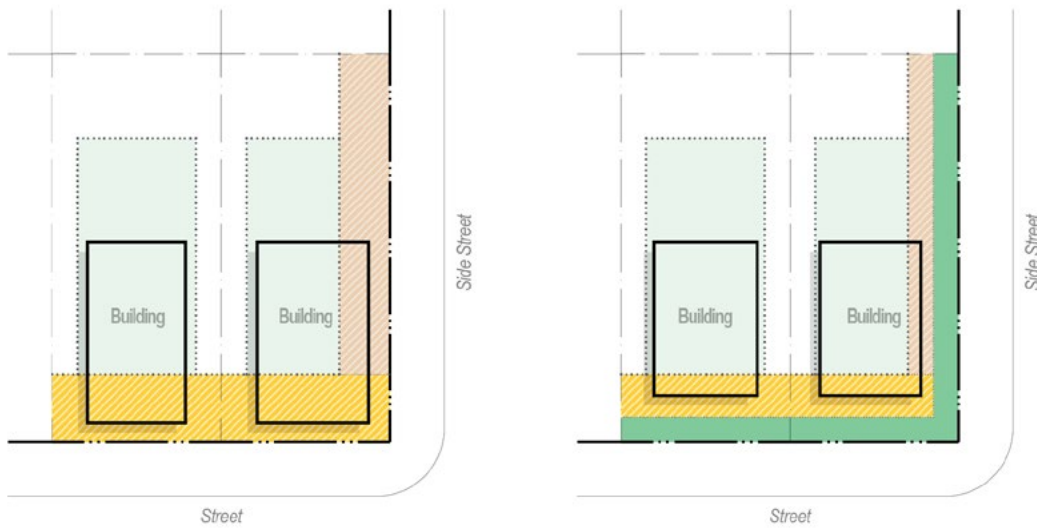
Build-to zone (Prepared by Houseal Lavigne)
